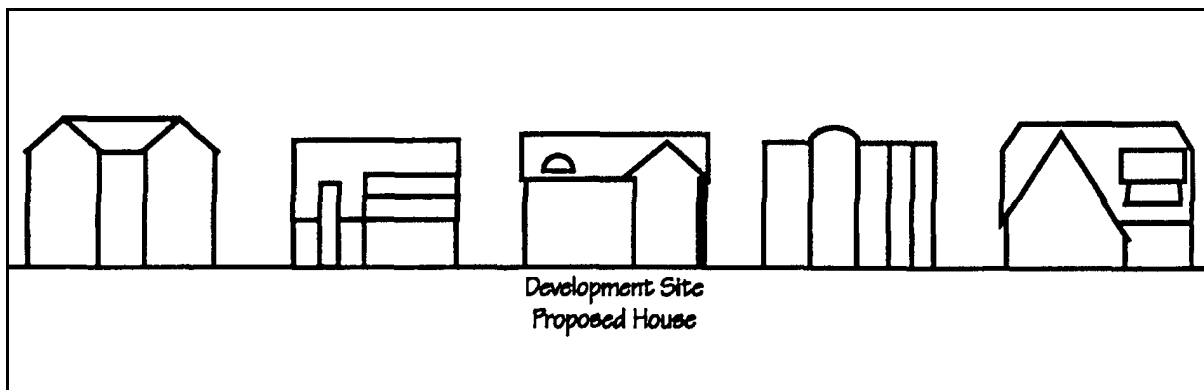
Streetscape Example (2) Showing Primary and Secondary Building Forms
